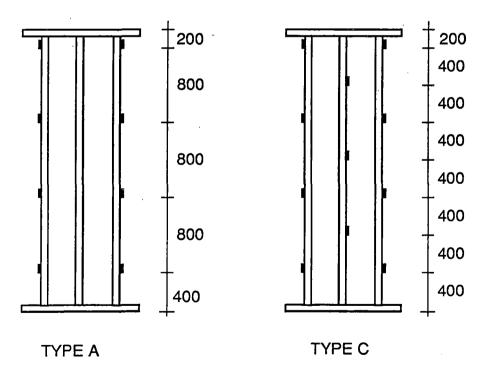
Location of Stain Gages in the Shear Connector Plate of the Wall Segments
